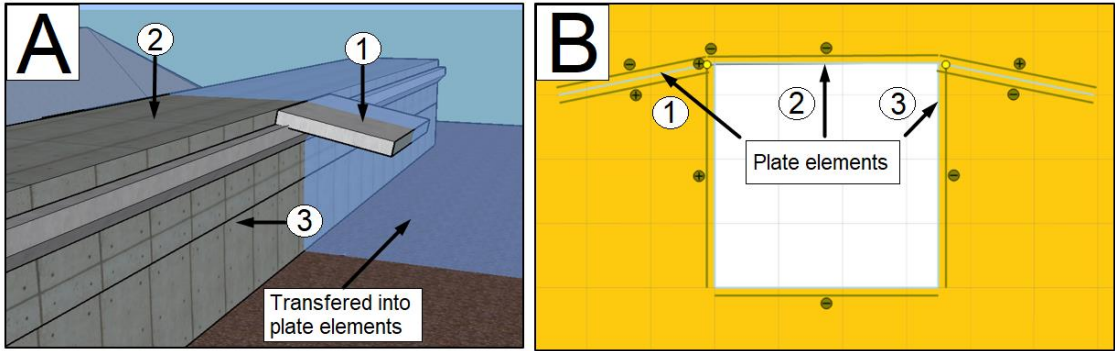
Transforming the concrete plates of a culvert into plane-strain, showing A) the section which intersects the structure corresponding to three different plate elements, and B) after transforming the structure into plate elements
